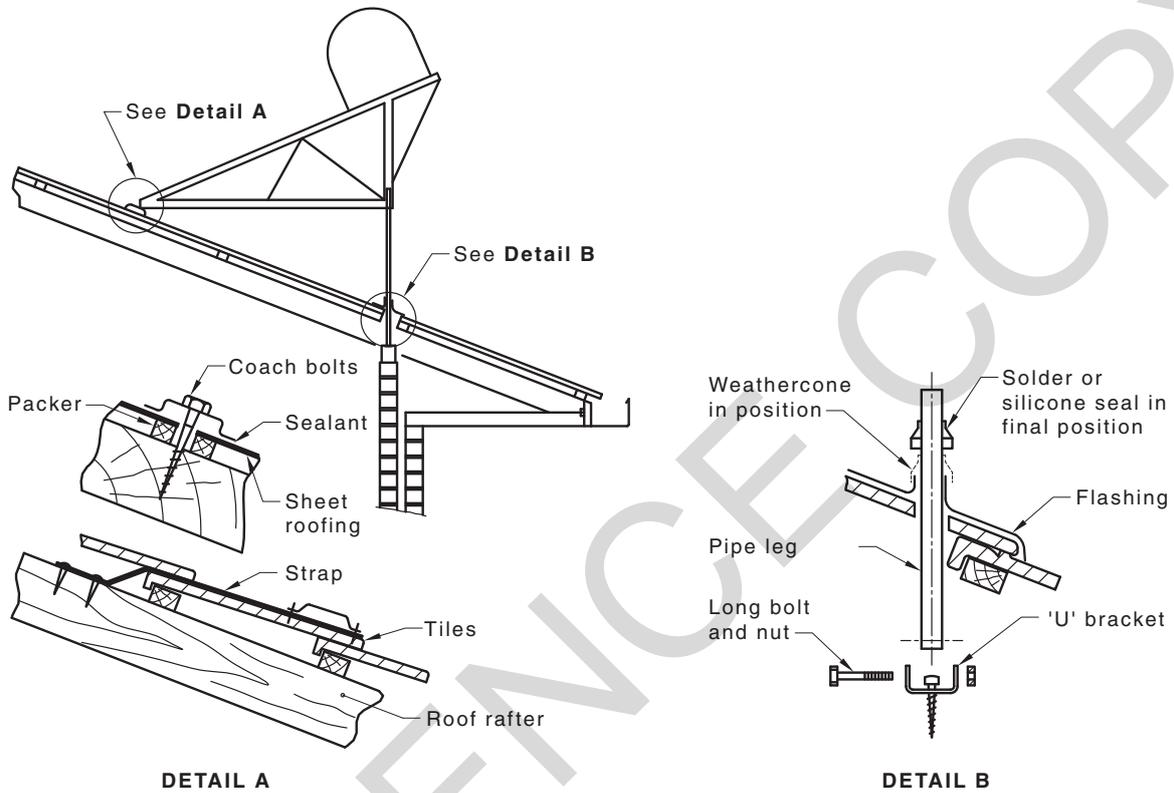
F2.2 ‘AGAINST PITCH’ INSTALLATION
